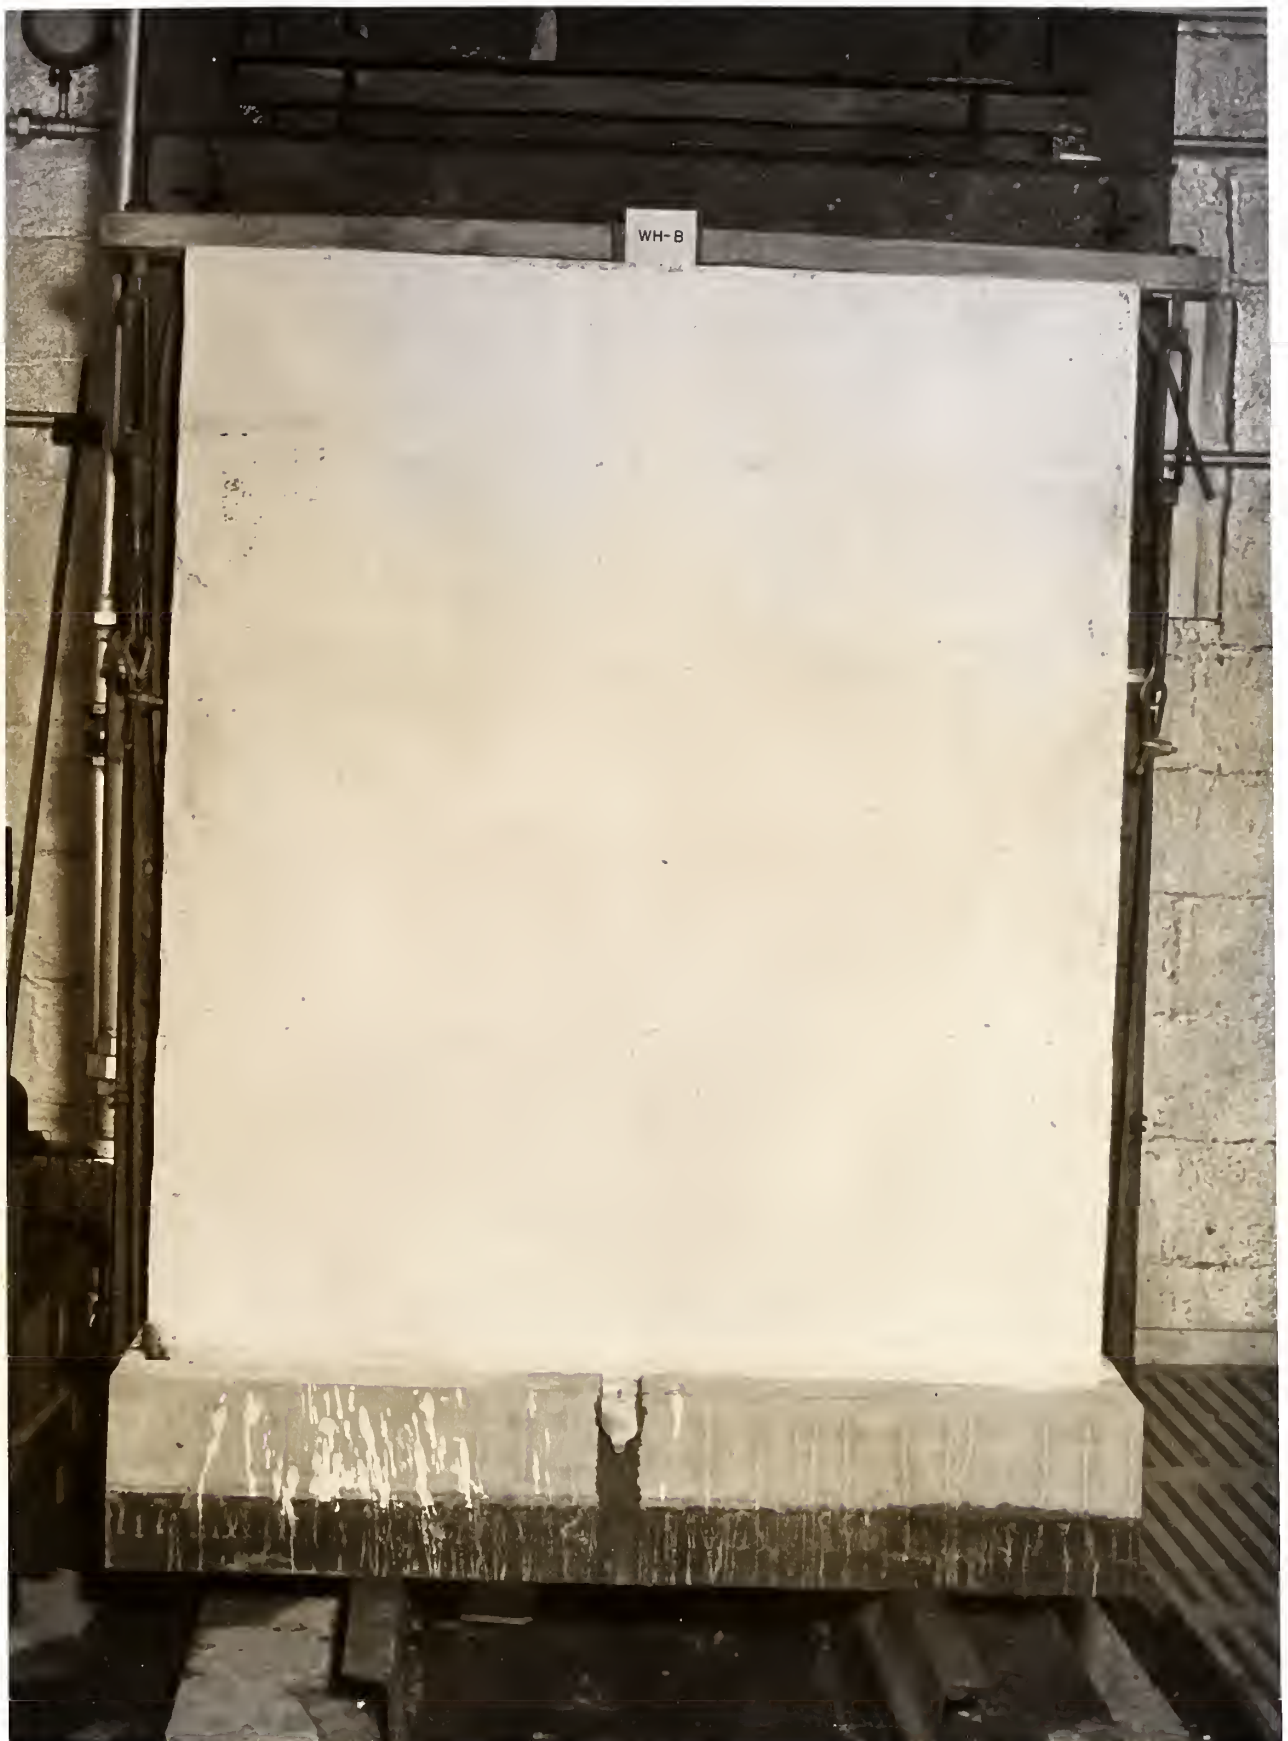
Wall B after test B-15. Test made after all openings in wall face had been sealed.
